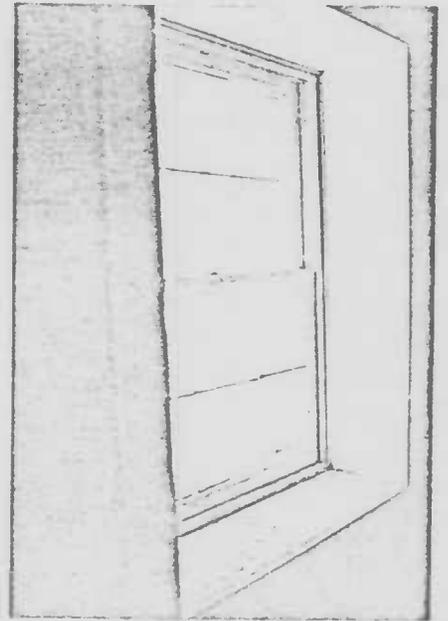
2ND FLOOR WINDOW & TRIM.
